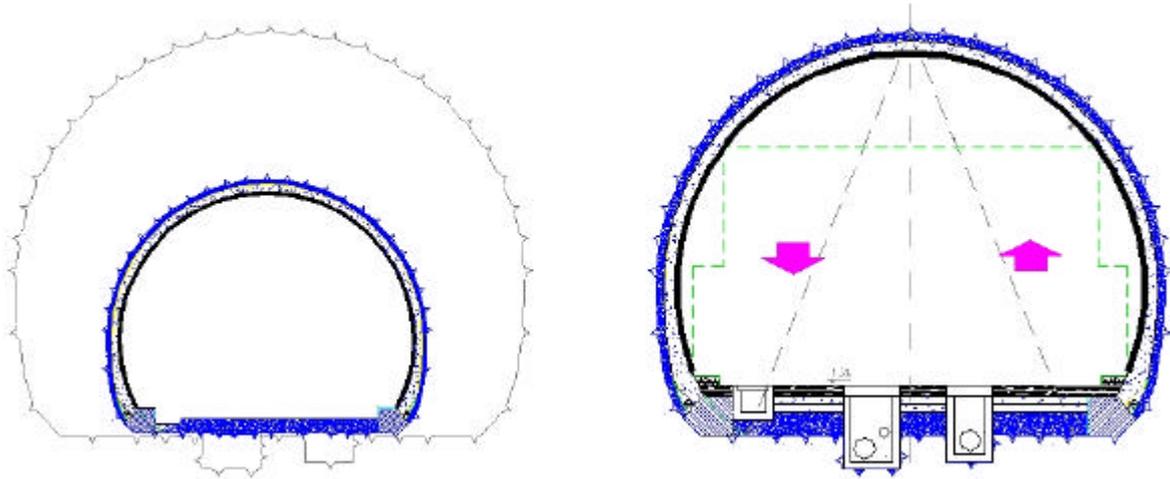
Existing tunnel cross section (with ventilation gallery suitable for future construction of second tunnel as proposed by UT DIS/EDL-D2 CONSULT)
